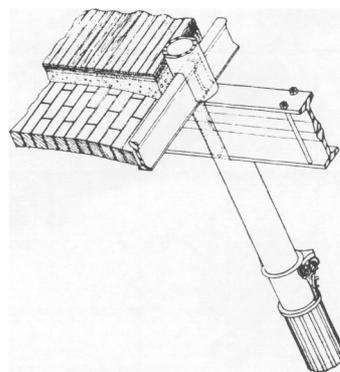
Construction detail of cast iron column-wrought iron tie rod-wrought iron beam and brick jack arch in an 18th century industrial building [47].
